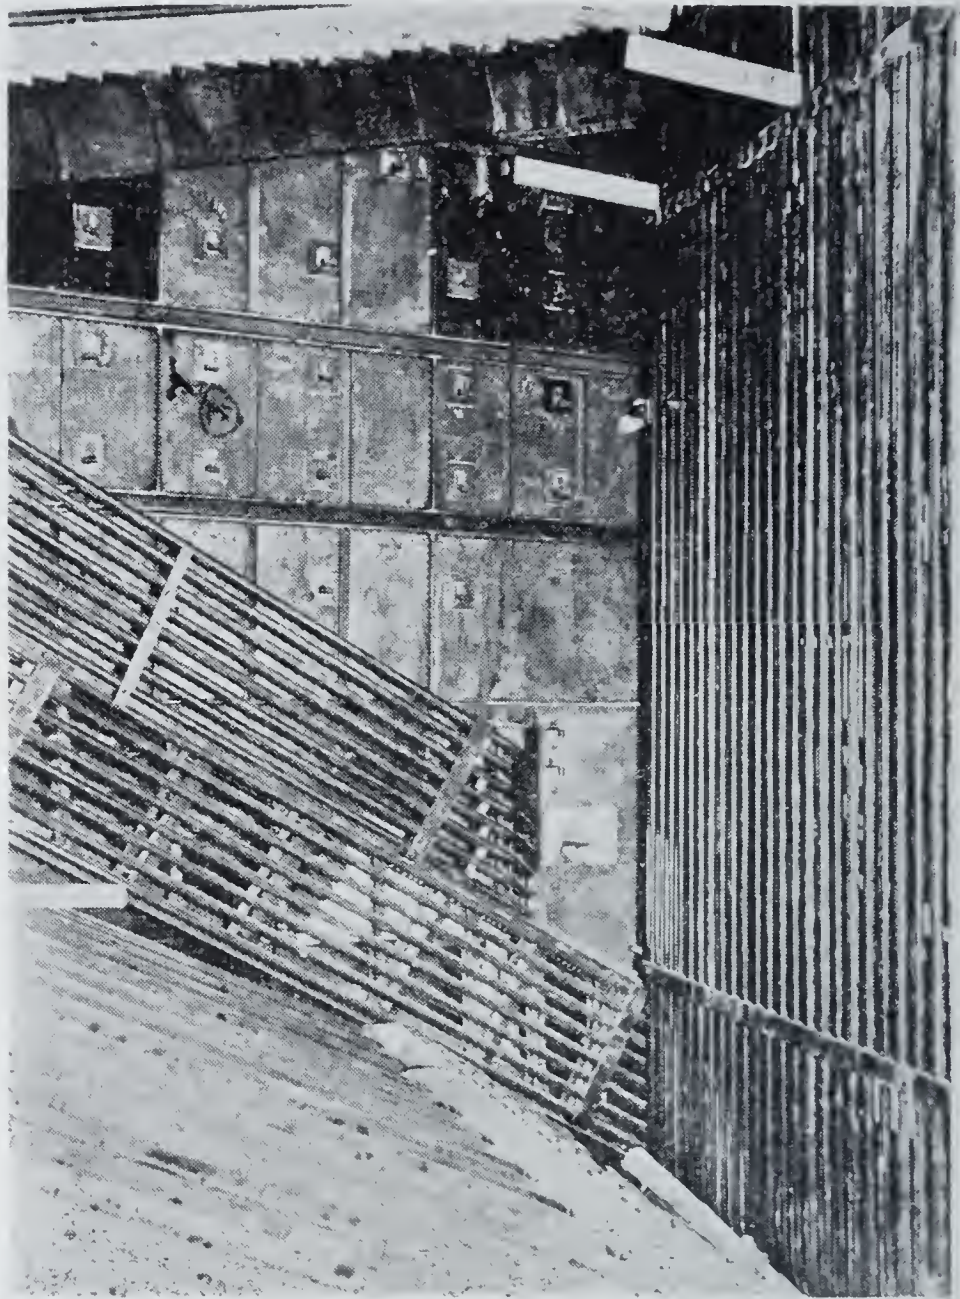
View During Erection, Showing Arrangement of Bare Tube Section in Side Wall.
